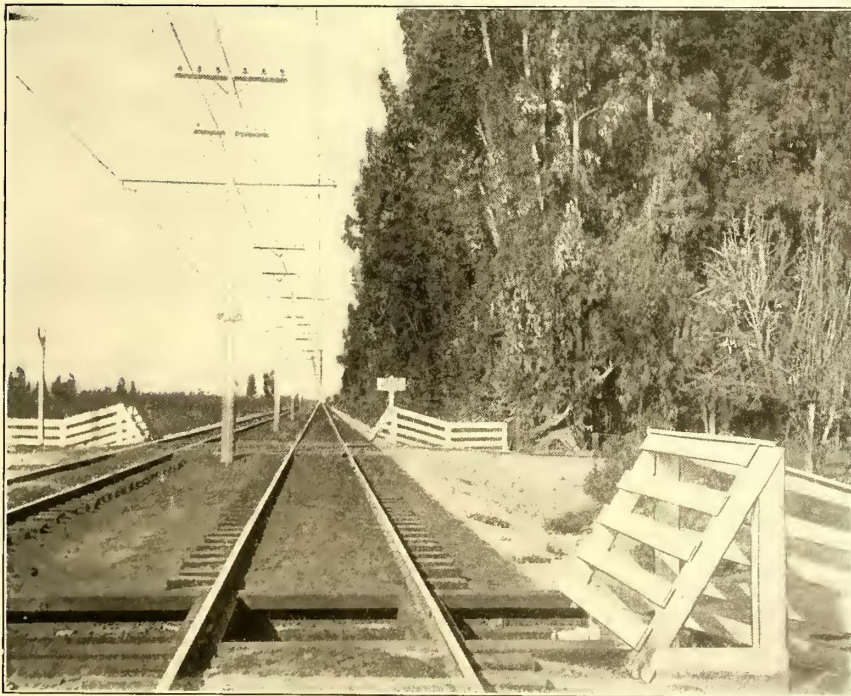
VIEW ON LONG BEACH LINE, SHOWING ROAD CROSSING
